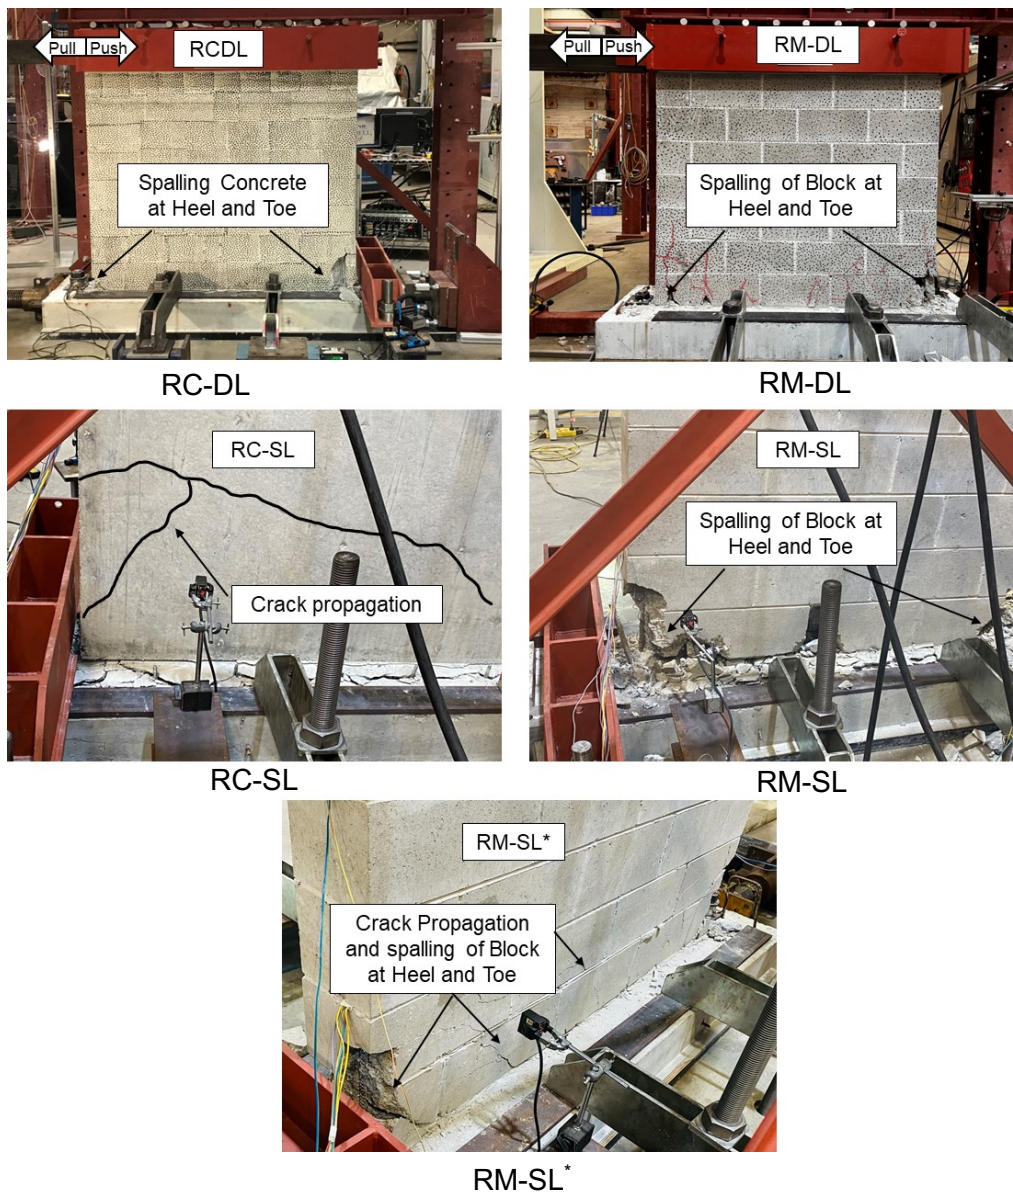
Typical failure pattern observed on single and double layered RC and RM shear walls Ghaseminia et al. (2023; 2024).
